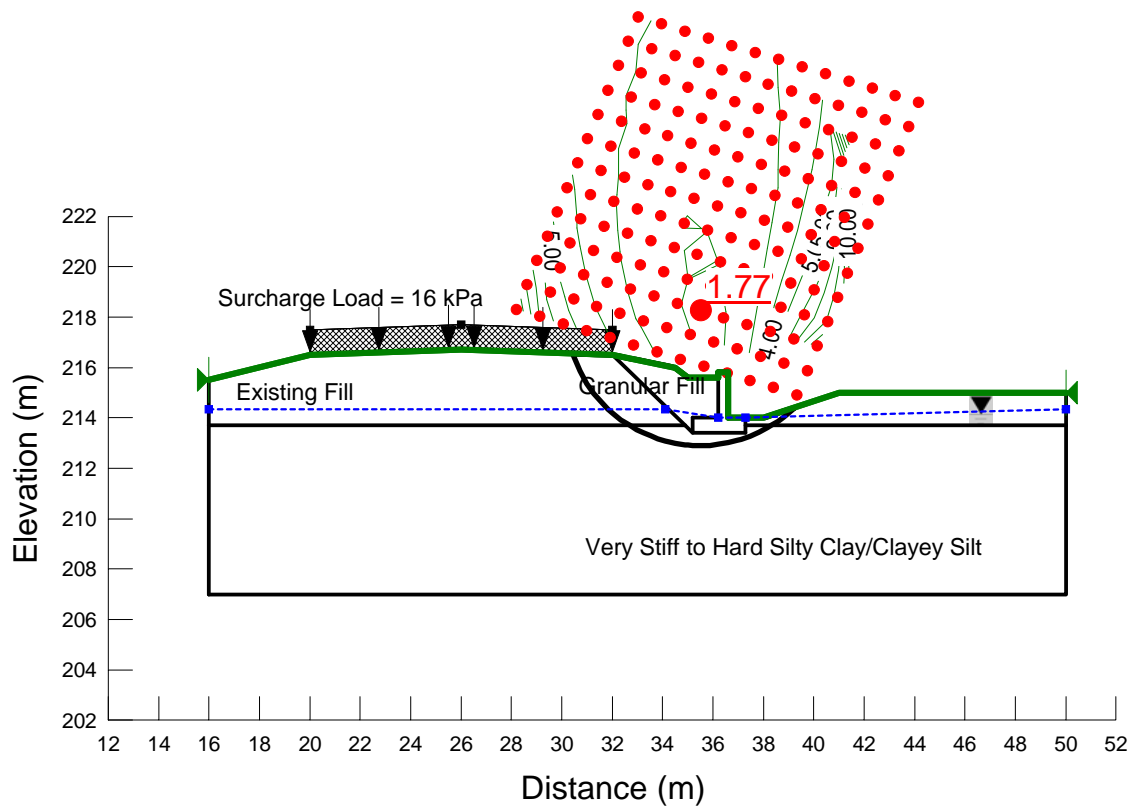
Slope Stability Analysis of Proposed Retaining Wall - Sta. 25+232
